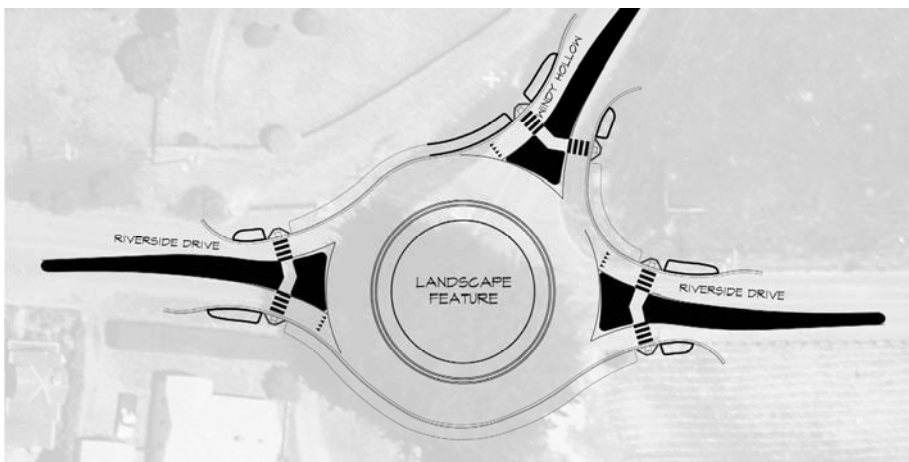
Roundabout Improvement at Windy Hollow Road/ Riverside Drive /Eureka Hill Road Intersection
